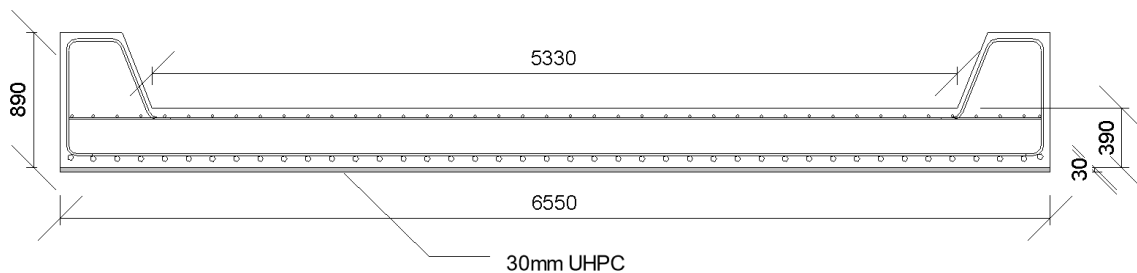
Bridge cross-section where a 30 mm UHPC overlay is applied at the underside of the bridge deck
